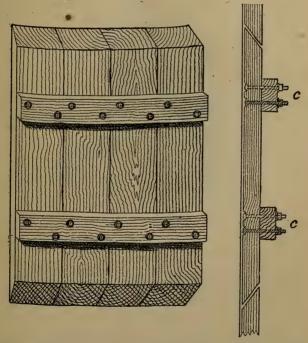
Appearance of door in stave silo after being sawed out, and side view in place. The opening is largest on the inside of silo. (Clinton.)
